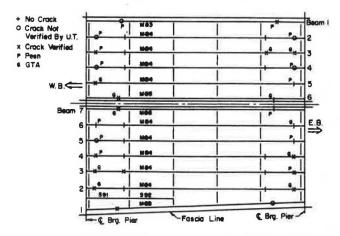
Repair methods on span 10, Yellow Mill Pond Bridge
